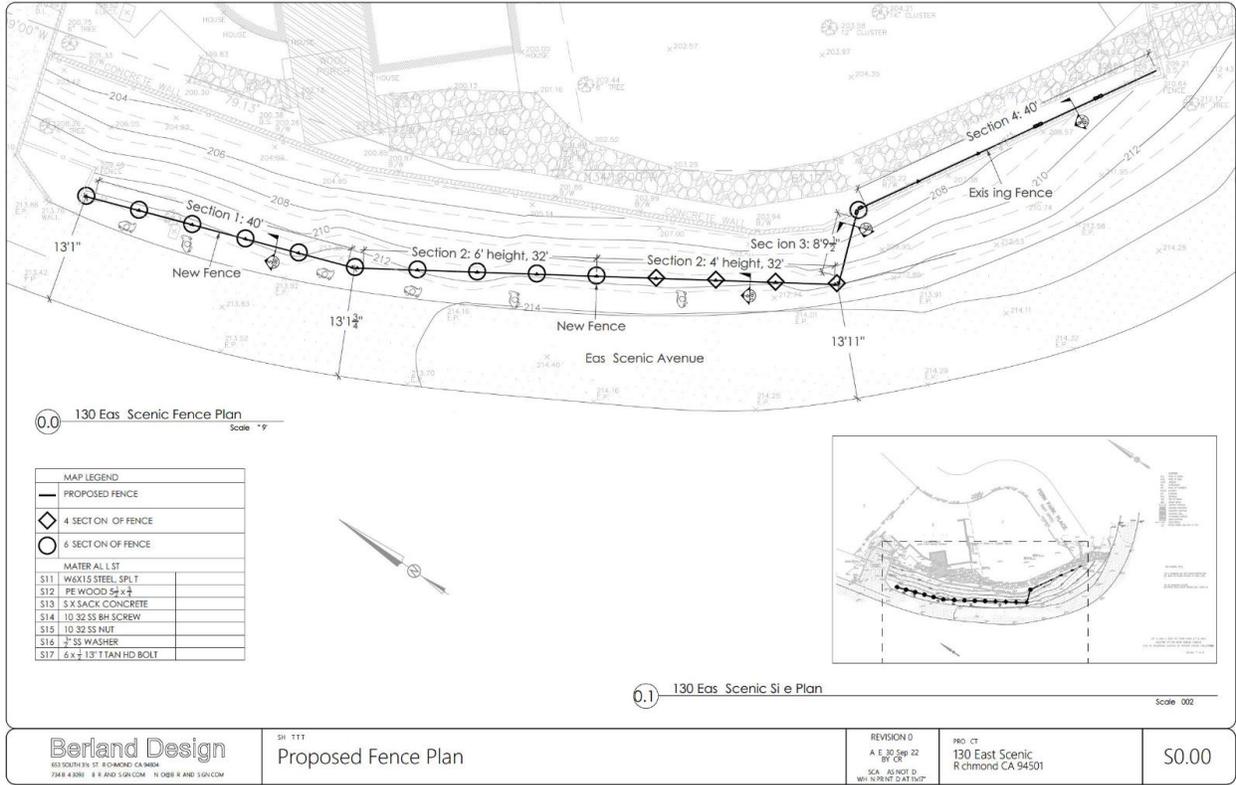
Site plan does not show dimensions between existing property lines and proposed fence
